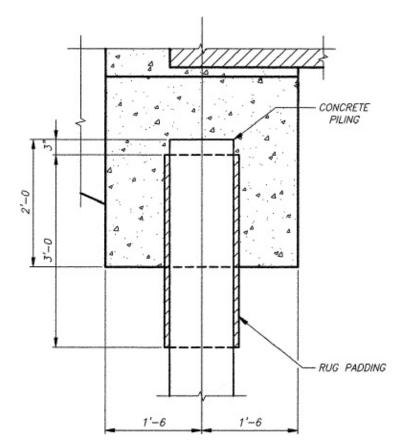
Excerpt from bridge contract plans showing pile wrapping detail
